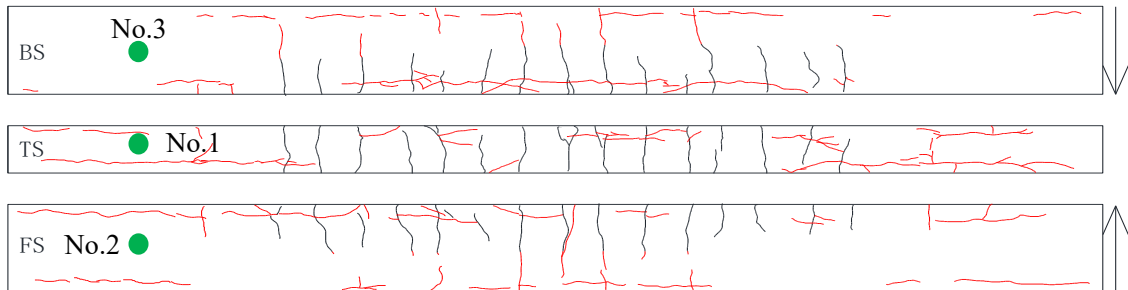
Cracking situation on C2 beam at 38 months
